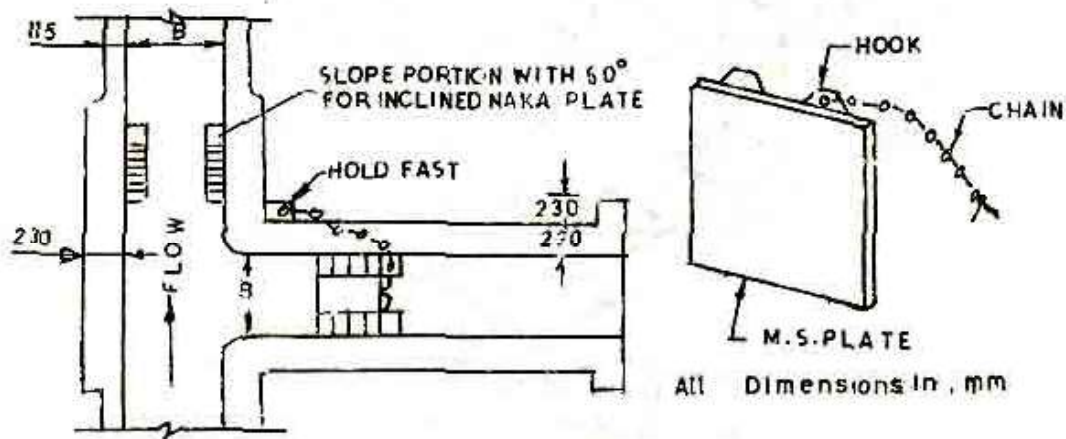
Typical Design Of M.S. Plate Nakka Structure
